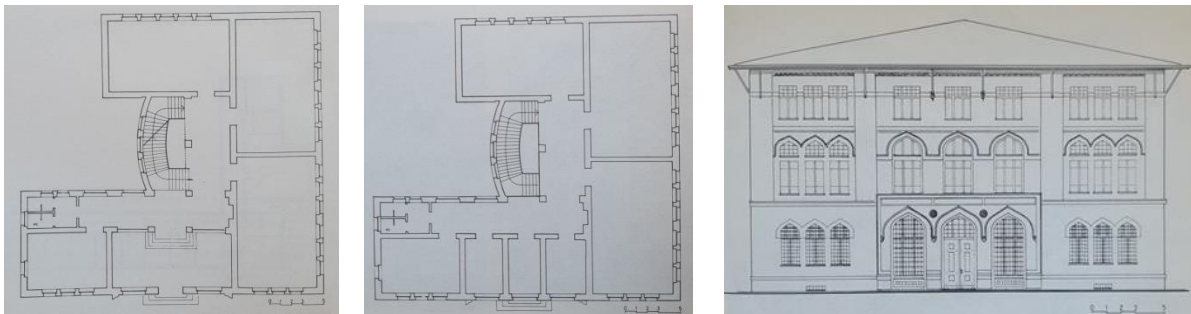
a)Medreset-ül Kuzat Ground Floor Plan, b)Medreset-ül Kuzat First Floor Plan c)Front Facade of Medreset-ül Kuzat [31]
